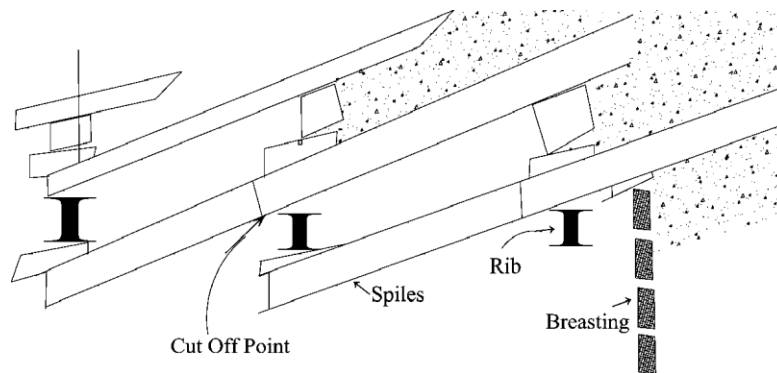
Spiling (Forepoling) Method of Supporting Running Ground
